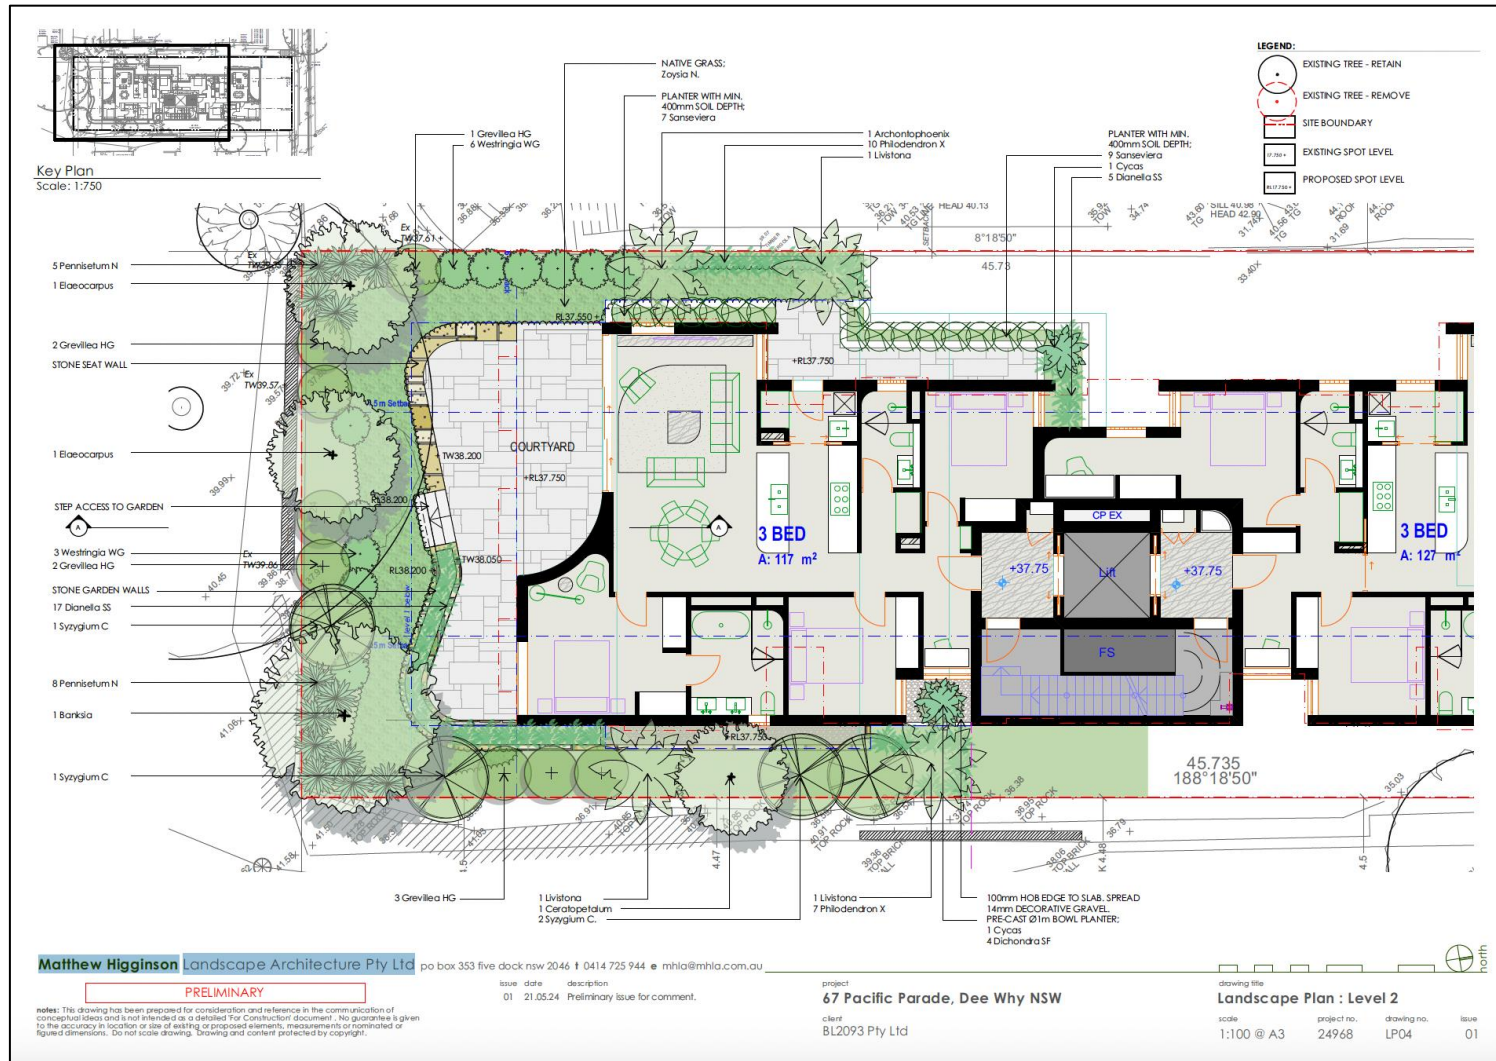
LANDSCAPE PLAN LEVEL 2
